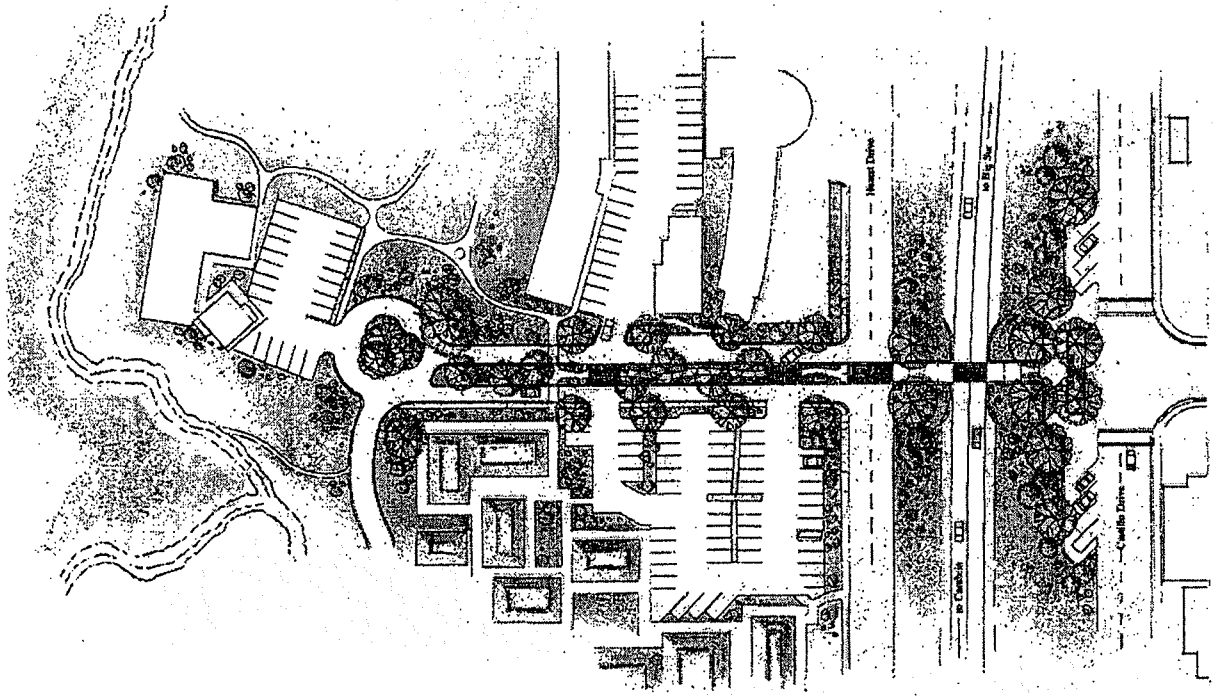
San Simeon Acres - Highway One Crossing Plan
